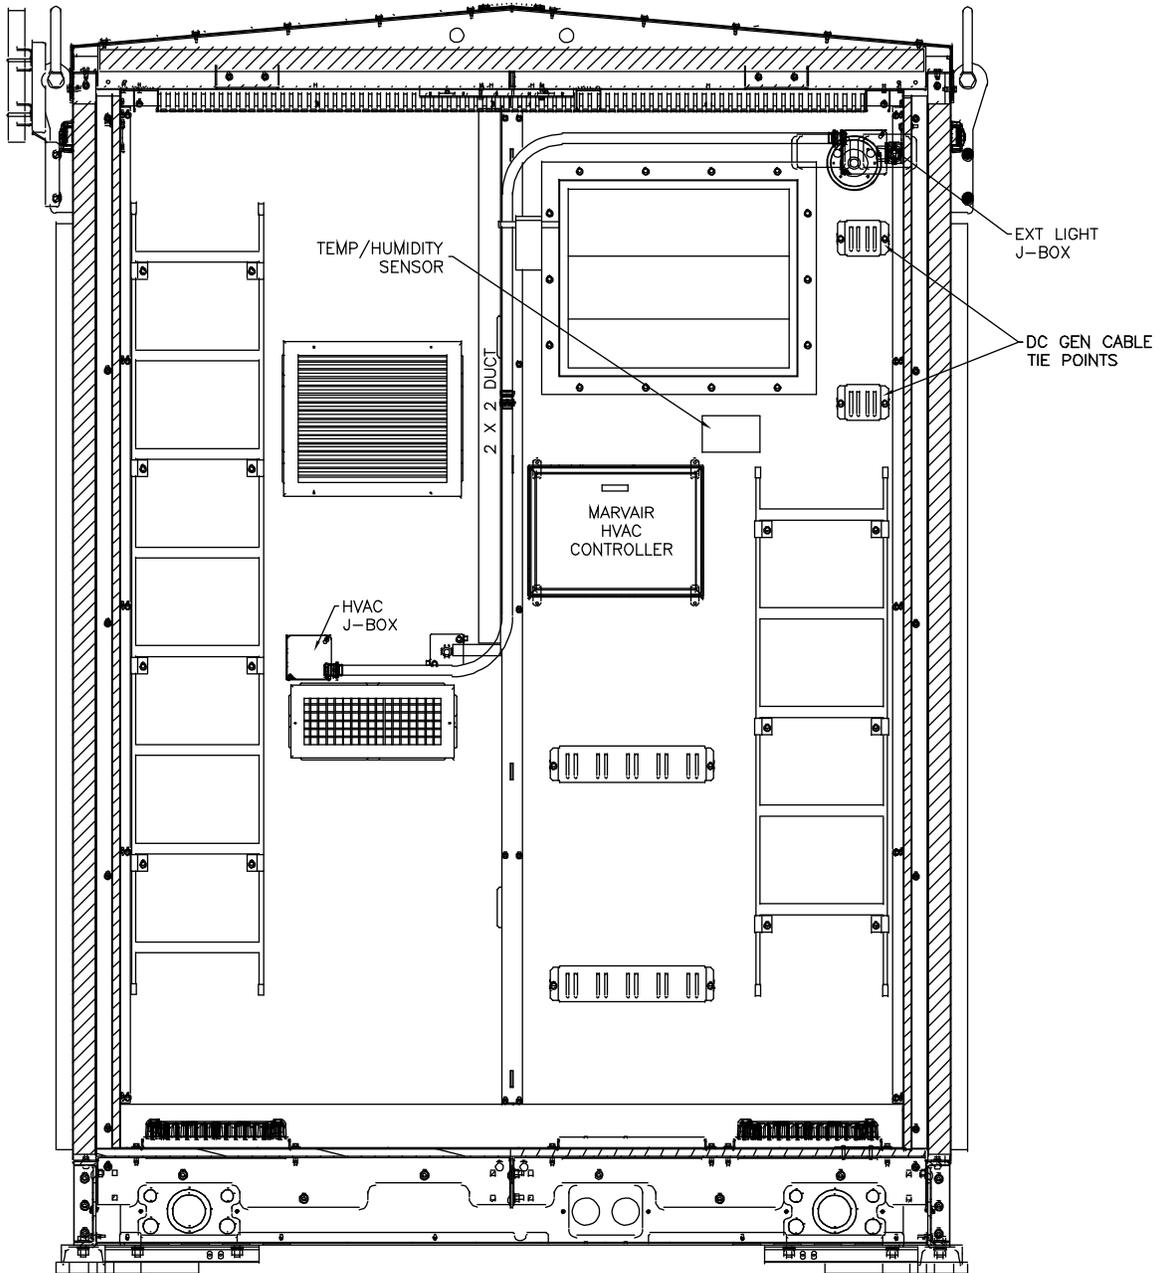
WIC Wall Detail Views (cont'd from previous page, cont'd on next page)
